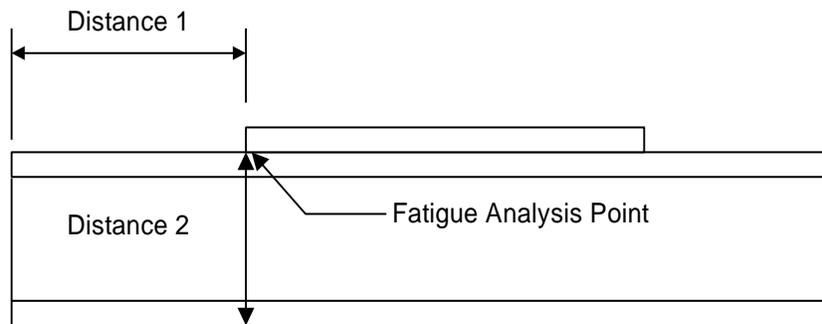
Fillet Weld at Top Cover Plate
